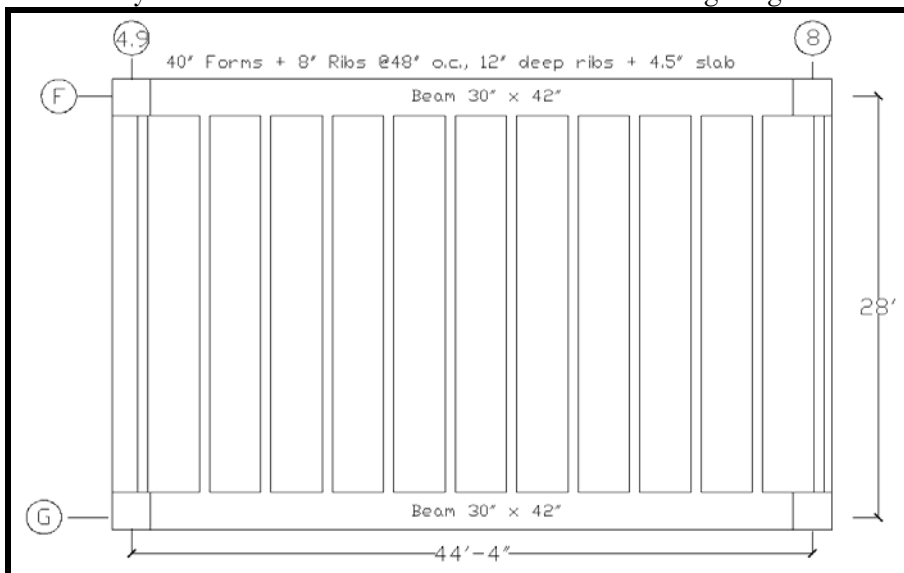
Typical bay layout for one-way concrete joist system, short span
